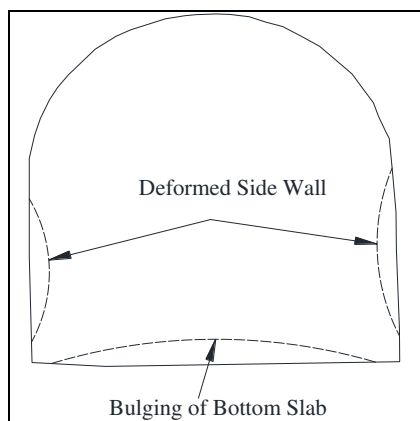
Side Wall Cracks in Longchi Tunnel
